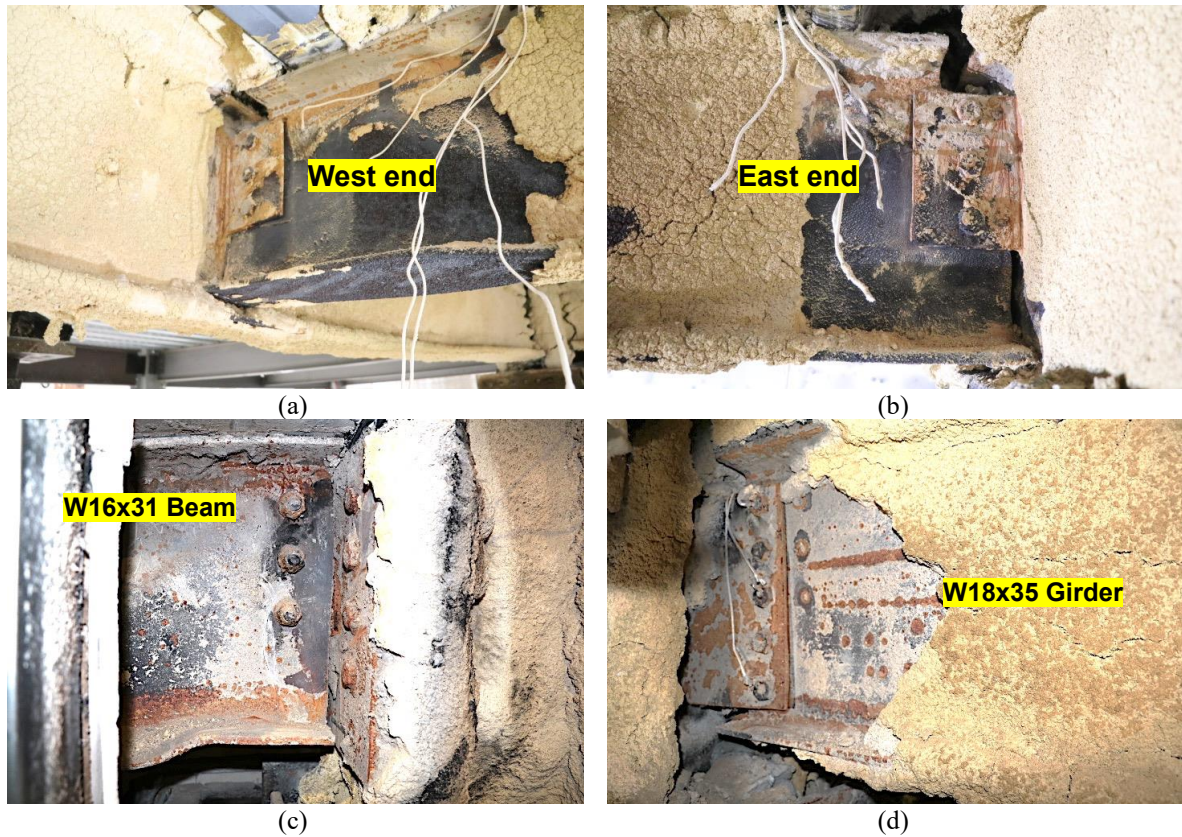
Post-test photographs of shear tab connections: (a-b) secondary beam, (c) north beam, and (d) east girder. Fireproofing was removed manually.
